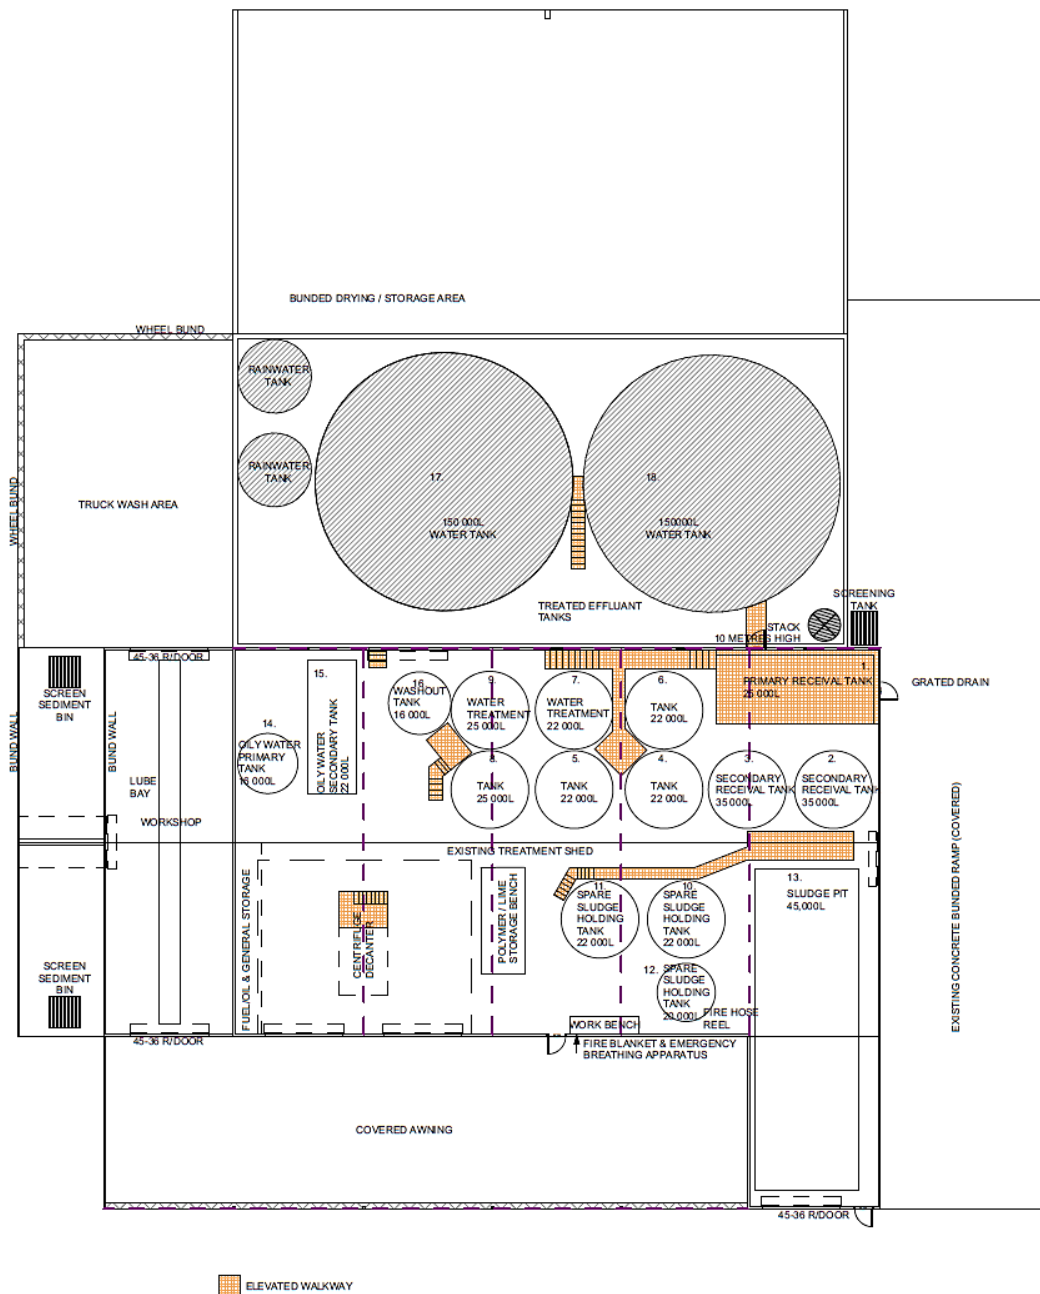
Plan of internal layout of main building showing treatment process and storage tanks
